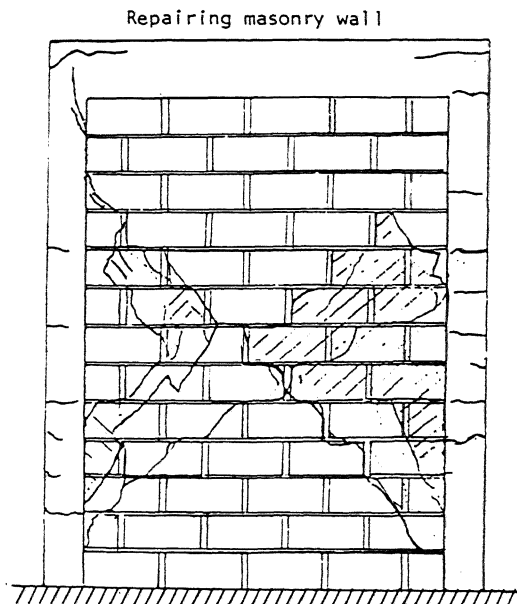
State of damage of original and repairing masonry wall (Technique N°3).
